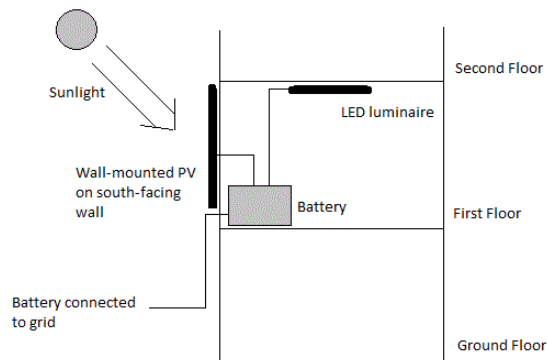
Cross section of the office room in the multi-level building, with PV mounted on the south-facing wall.
